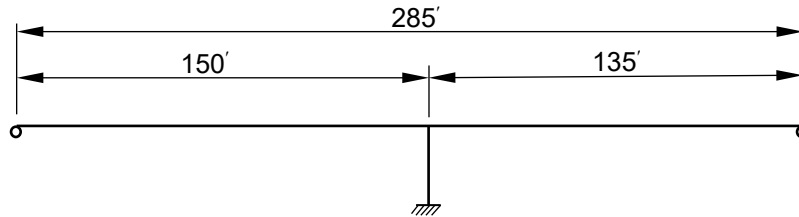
Example Bridge Elevation for Substructure Calculations
